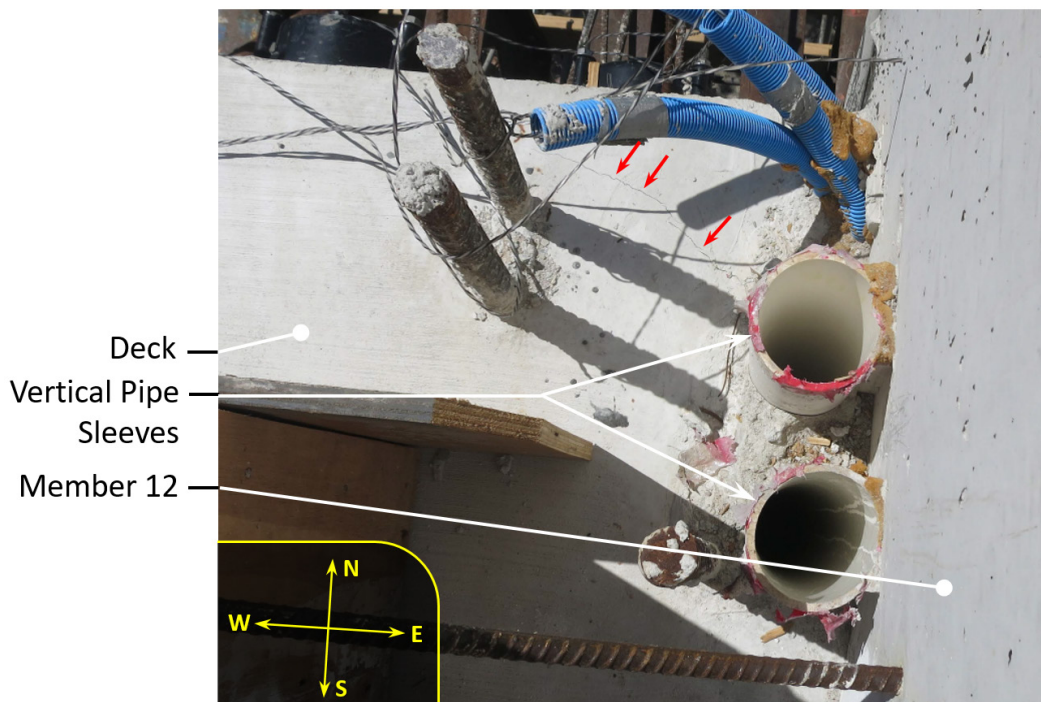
Photograph showing the deck on the west side of member 12 prior to SPMT transport. Captured on March 8, 2018. Corresponds to Bridge Factors Photographs – FIGG Bridge Engineers, Inc. Photo Submission FCA 10-9.
